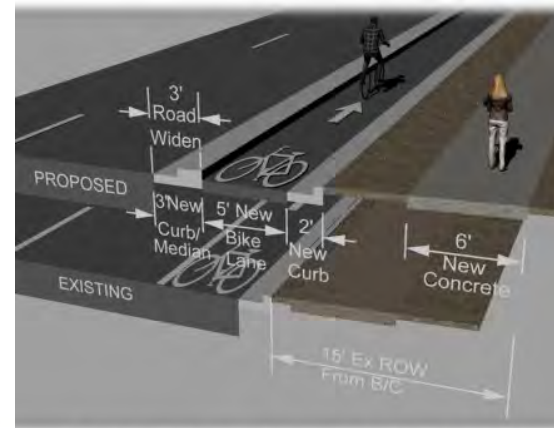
Separated Bike Lane (median) Typical Section/Rendering
